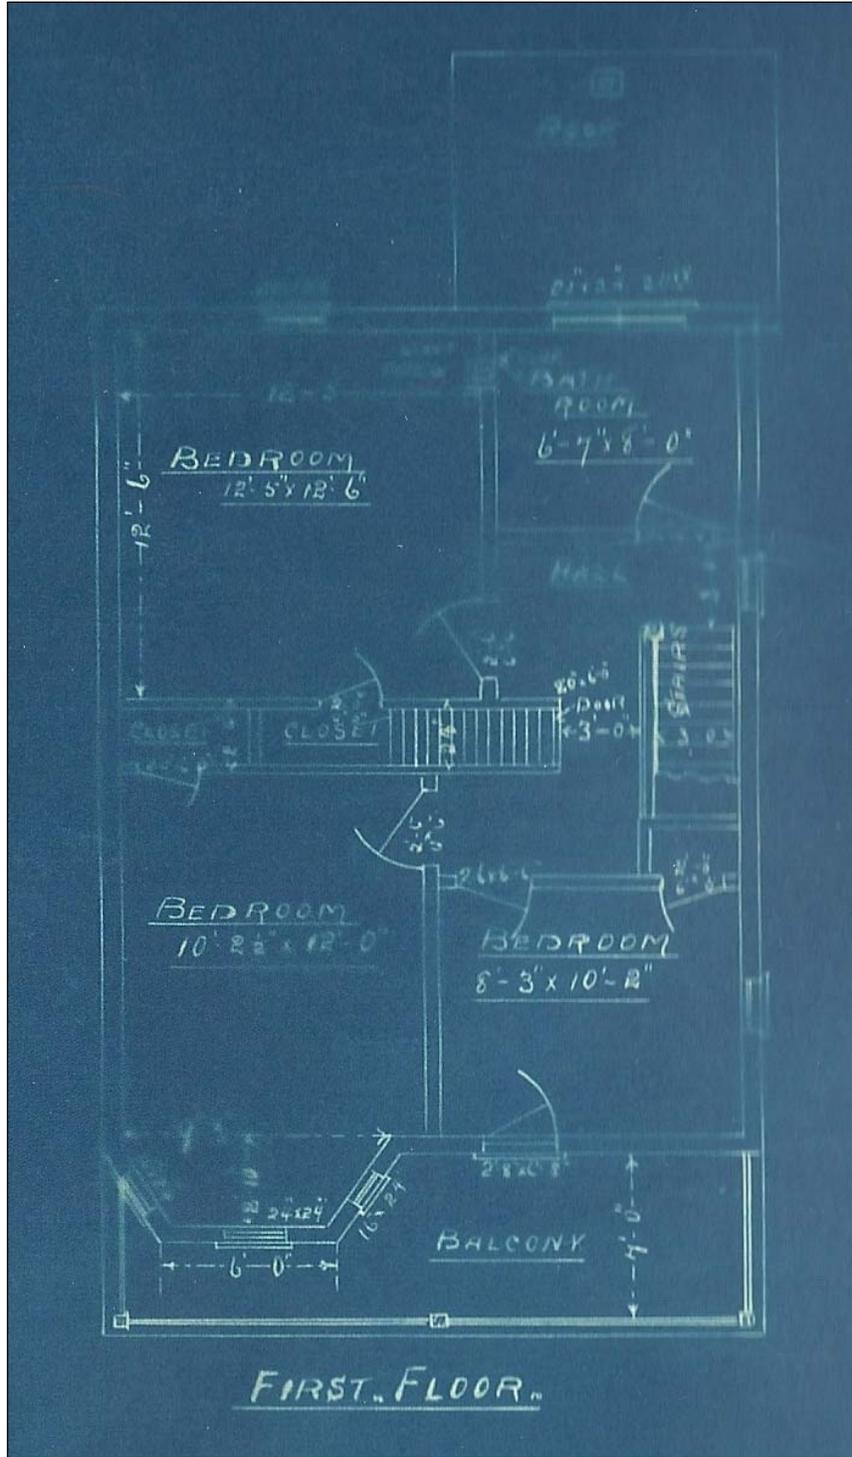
Architect’s Plans, Blais House, “First Floor”. (Courtesy of owner.)
